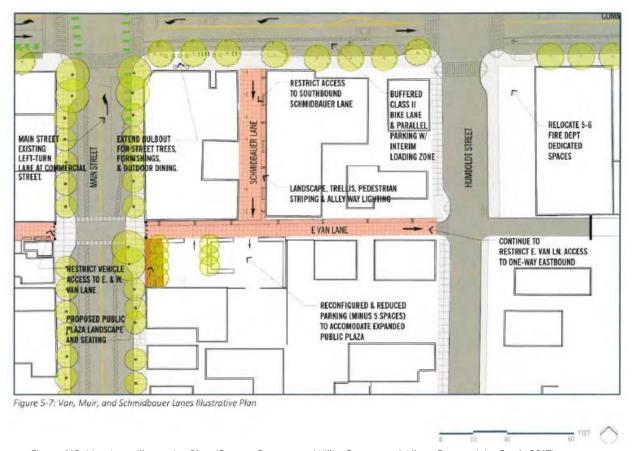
Van Lane Illustrative Plan (Source: Downtown Willits Streets and Alleys Connectivity Study,2017)
